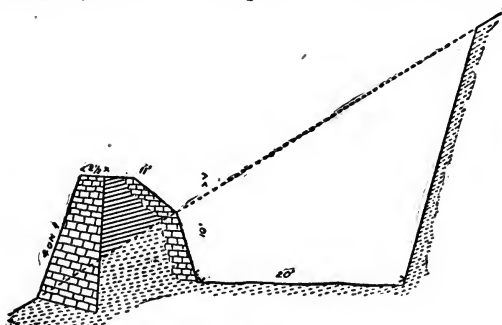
ROCK CROSS-SECTION. TURLOCK CANAL.
